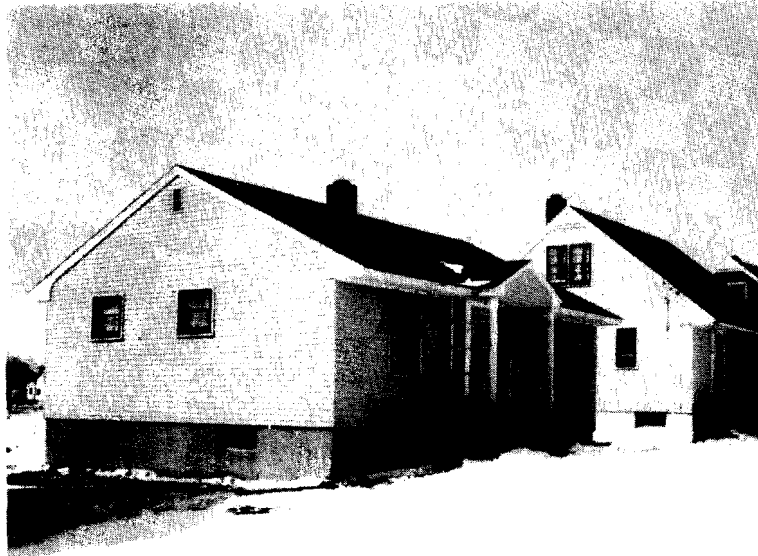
Limited Peeling on South Wall, 23 Westminster Ave.
